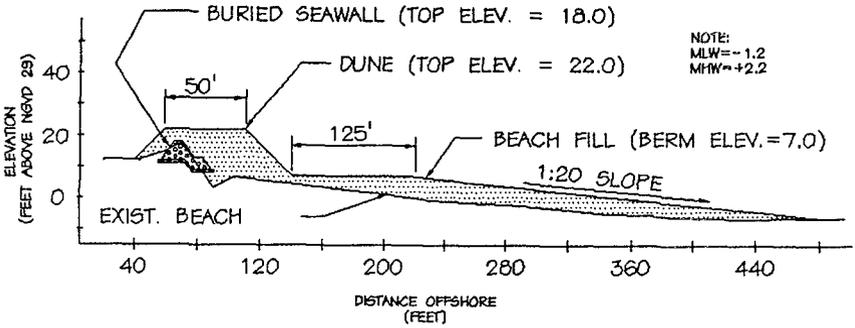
Cross-section of dune/beach/buried seawall design (soft alternative)
